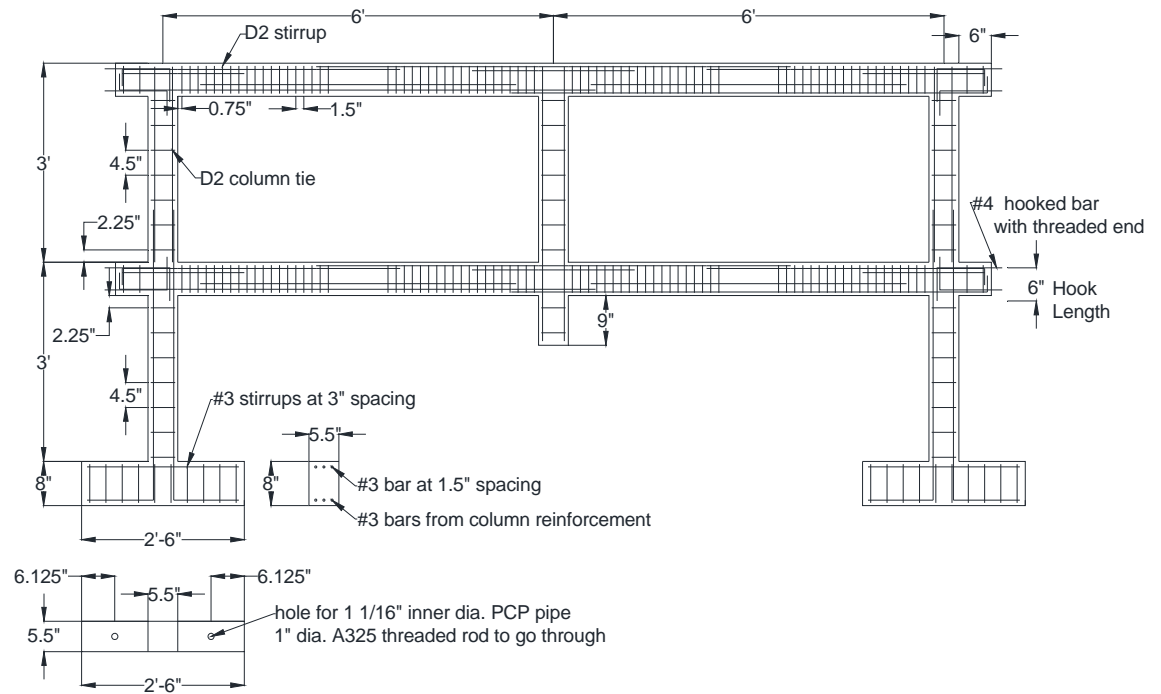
Transverse reinforcement layout for continuous reinforcement test frame
